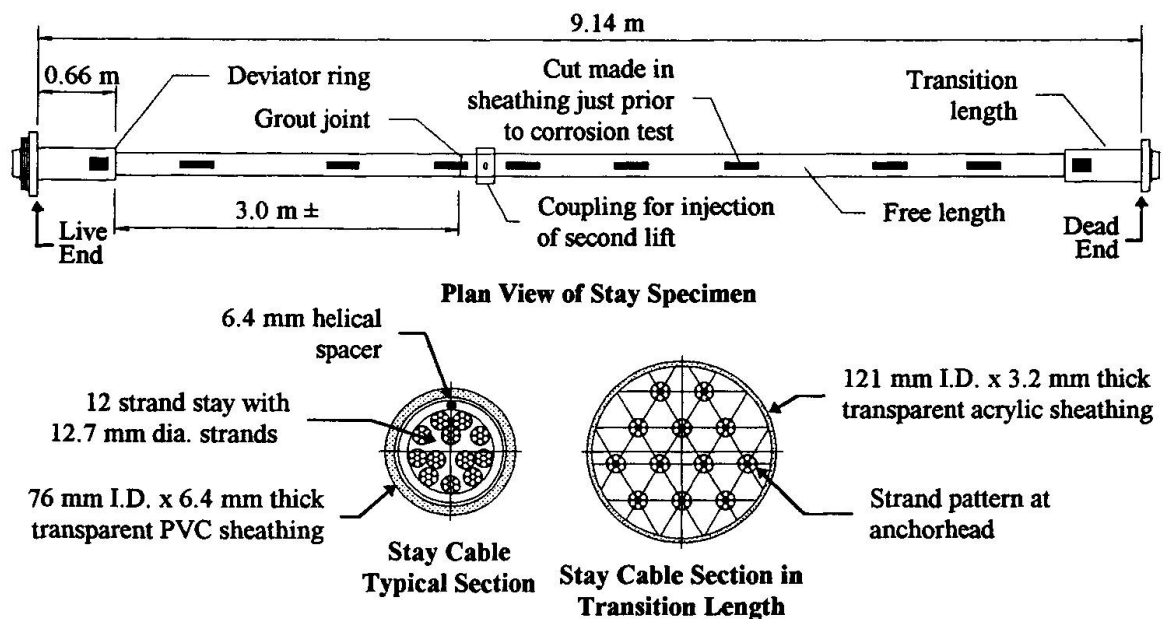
Details of Large Scale Stay Cable Specimens.
